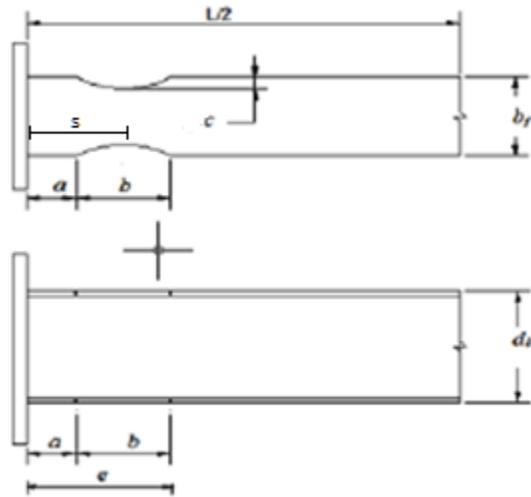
Radius Cut RBS Geometry Detail (Ajay & Gaurang, 2013)
